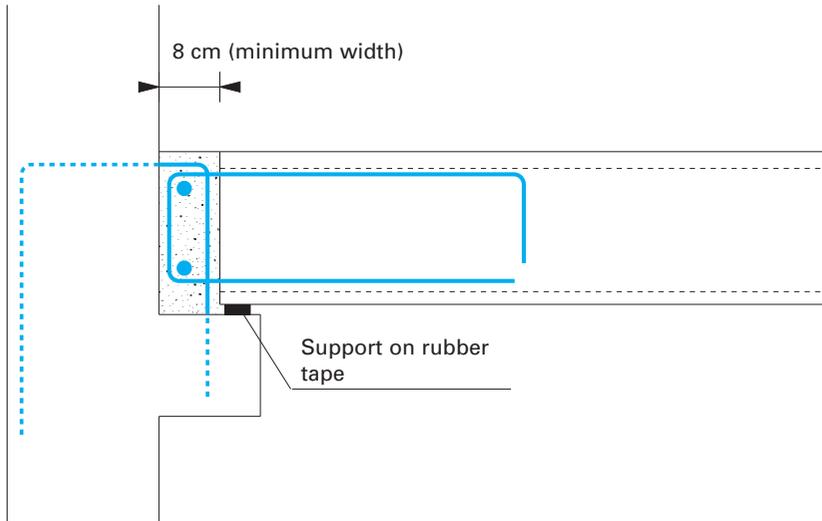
The wall - hollow core floor connection with a bond of simple support.
